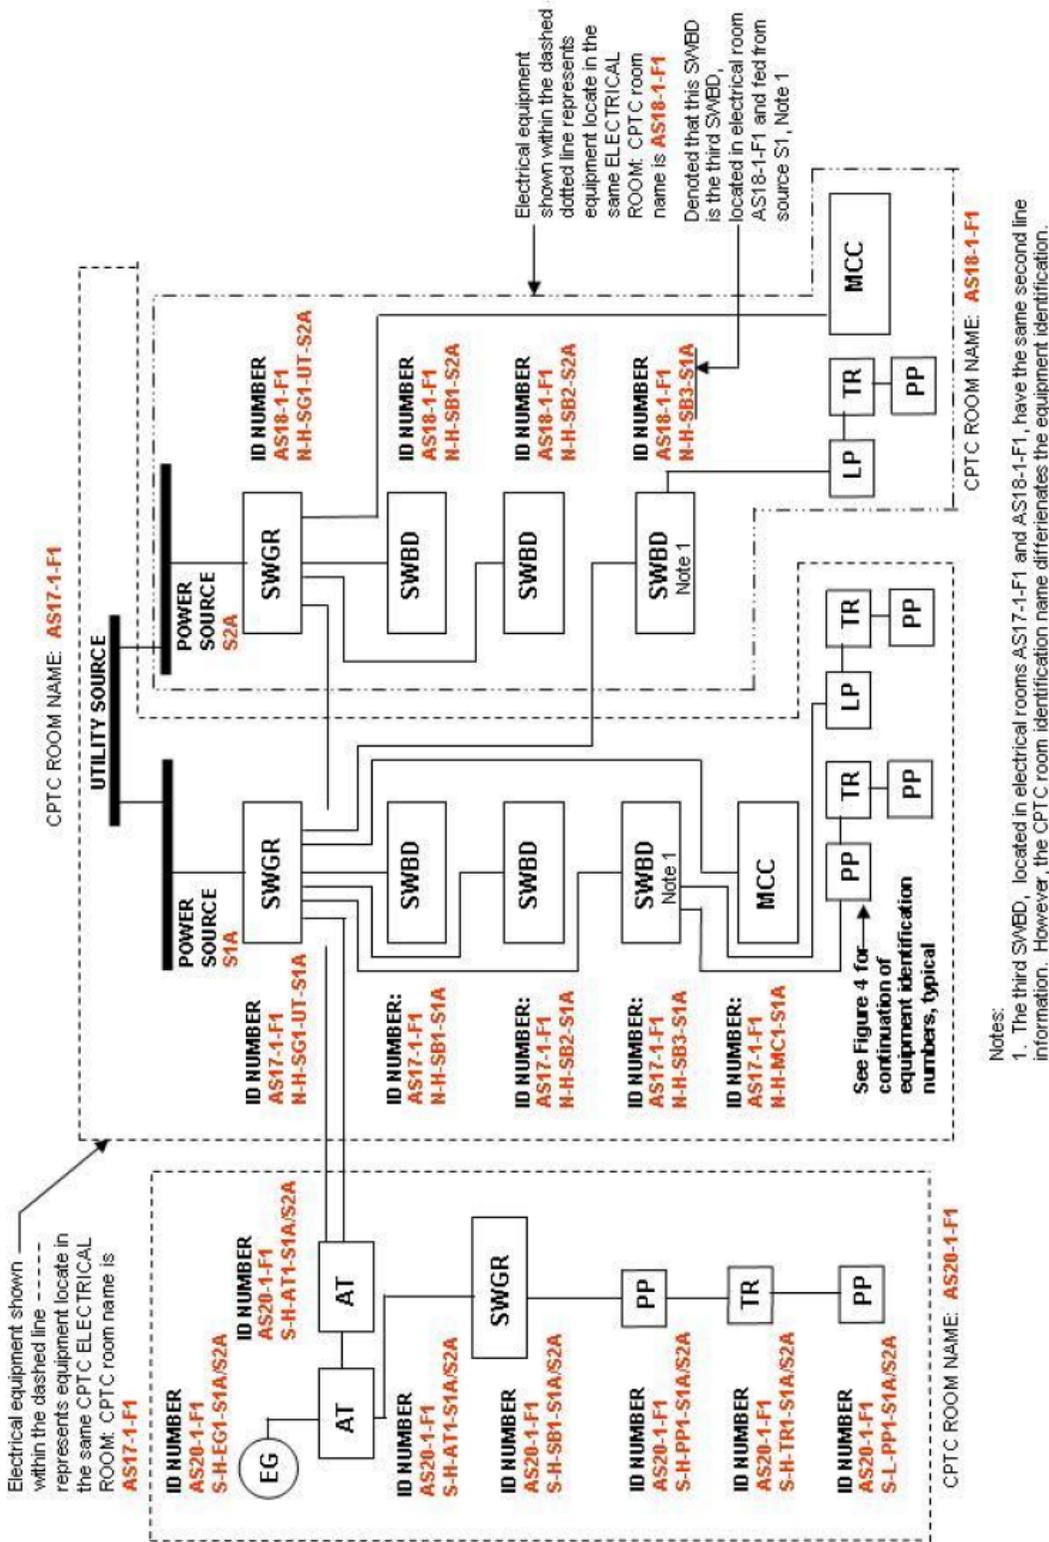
Electrical Equipment Room Layout Riser Diagram
